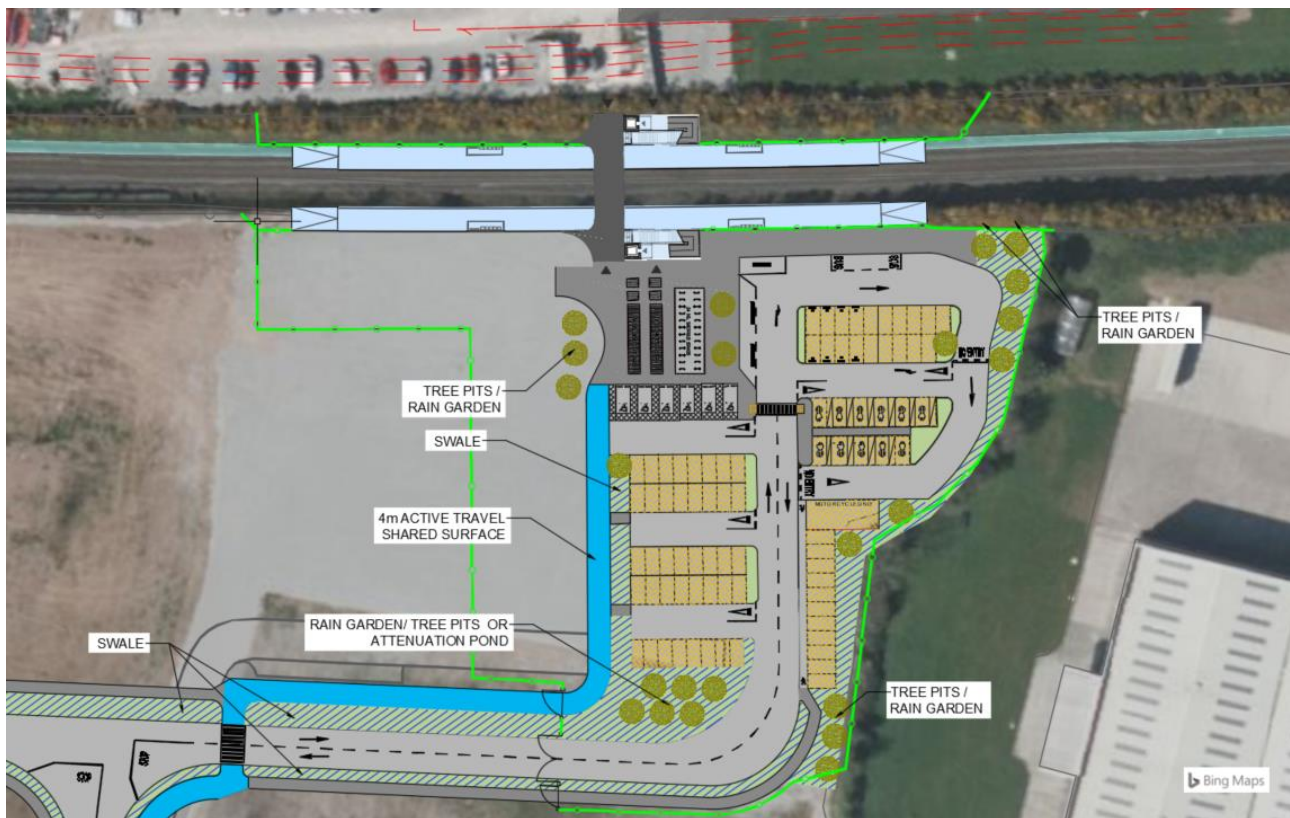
Carrigtwohill West Local Park and Ride Car Park Layout
